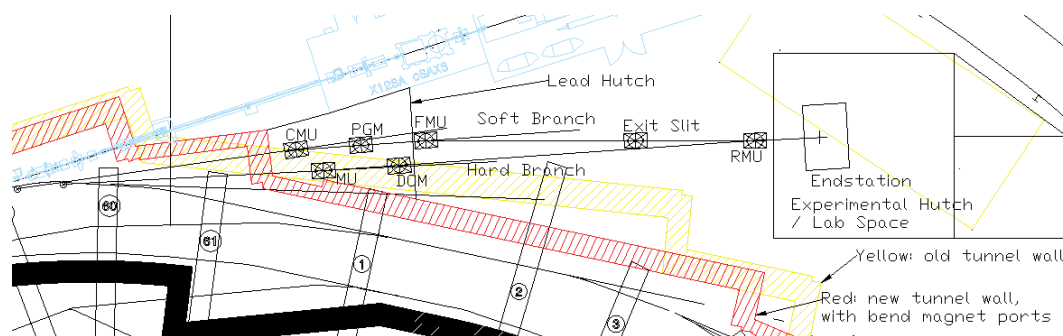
Floor Plan concept of the planned In Situ Spectroscopy beamline at X12D, at X09D the same floor plan is possible, without the need of shielding wall modifications
